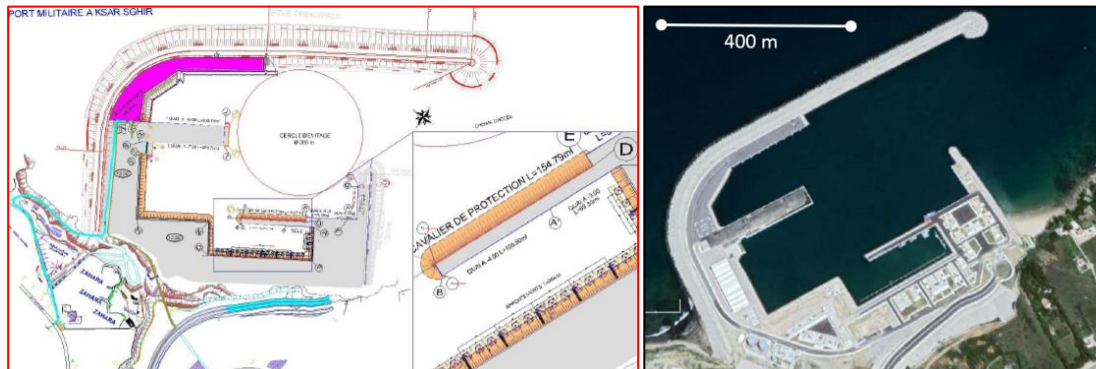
Quay situation -4/zh on the ground plan (left), aerial image of the structure (right)
